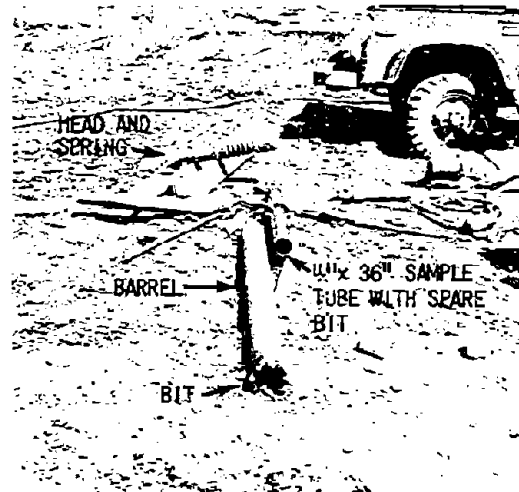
PHOTO D. PITCHER BARREL USED ON HOLE S-20. HERE DISASSEMBLED, PARTS LABELLED
